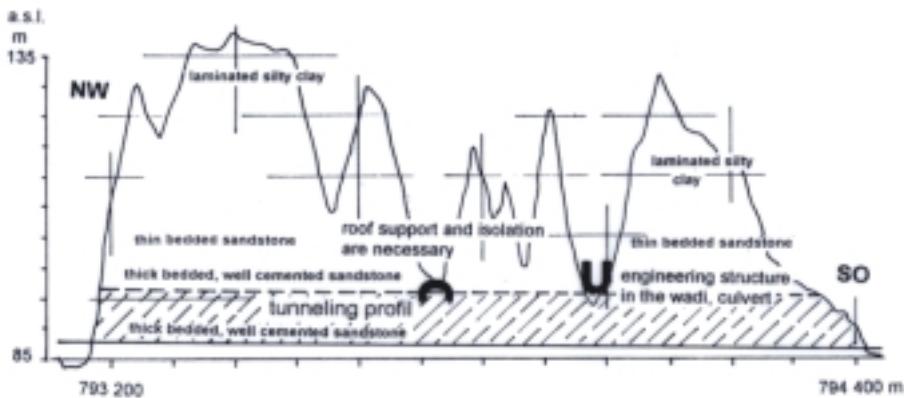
Simplified cross-section of the tunnel version, el serag section
